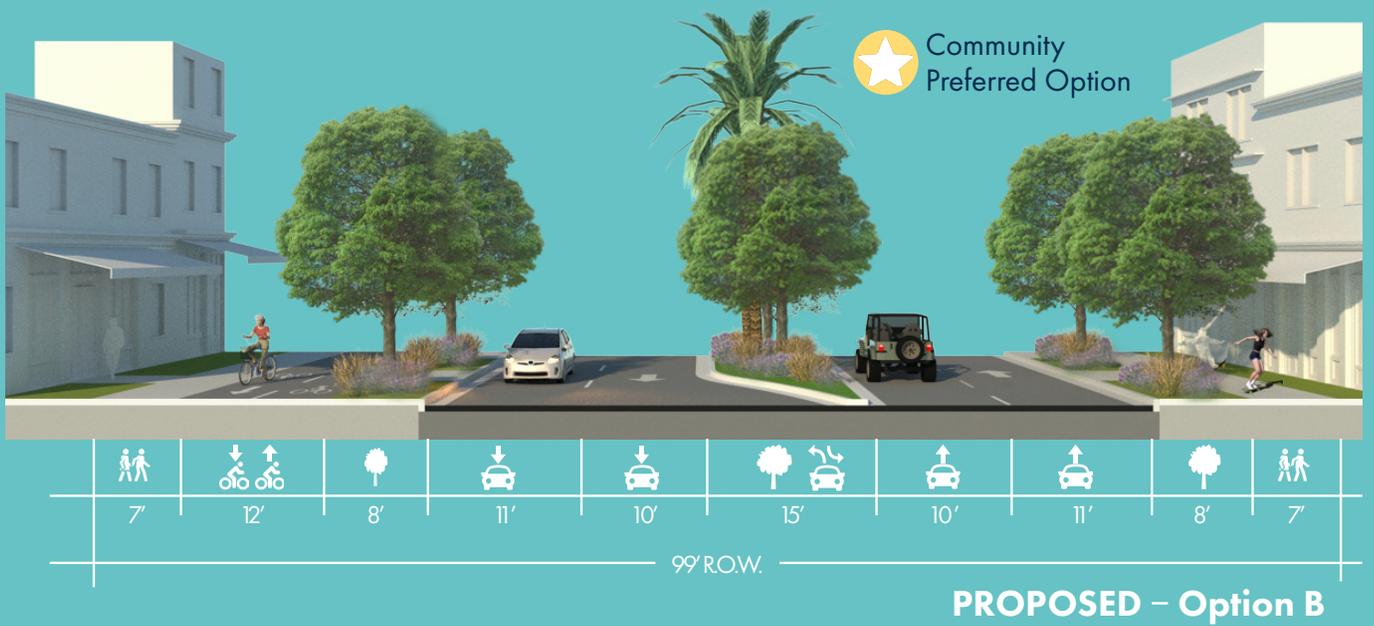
Atlantic Boulevard Proposed Street Sections
